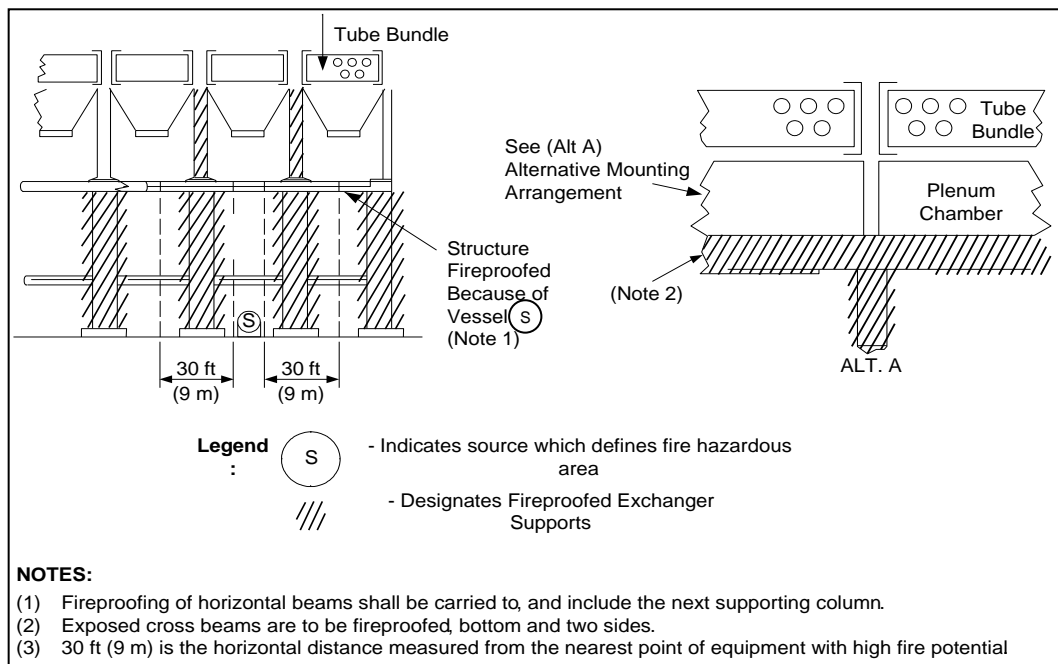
Fireproofing Supports Air-cooled Heat Exchangers located above Other Equipment
